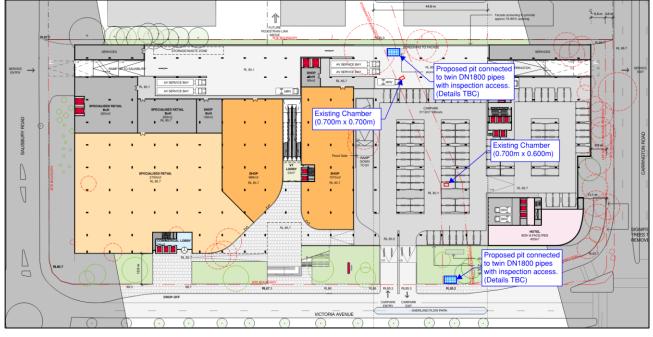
Proposed Inlet Pit Locations Connected to Existing twin DN1800 Pipes
